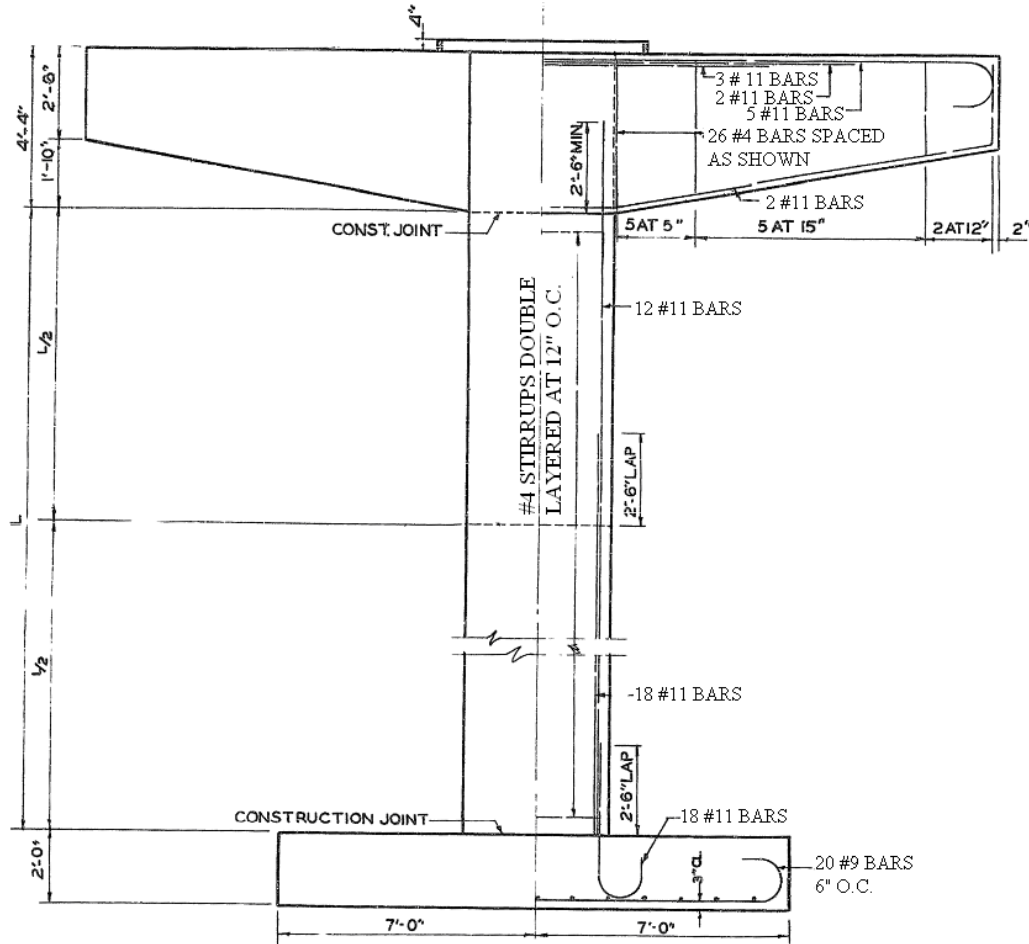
Pier Cap, Column, and Footing Detail (Ref. GDOT Drawing)
